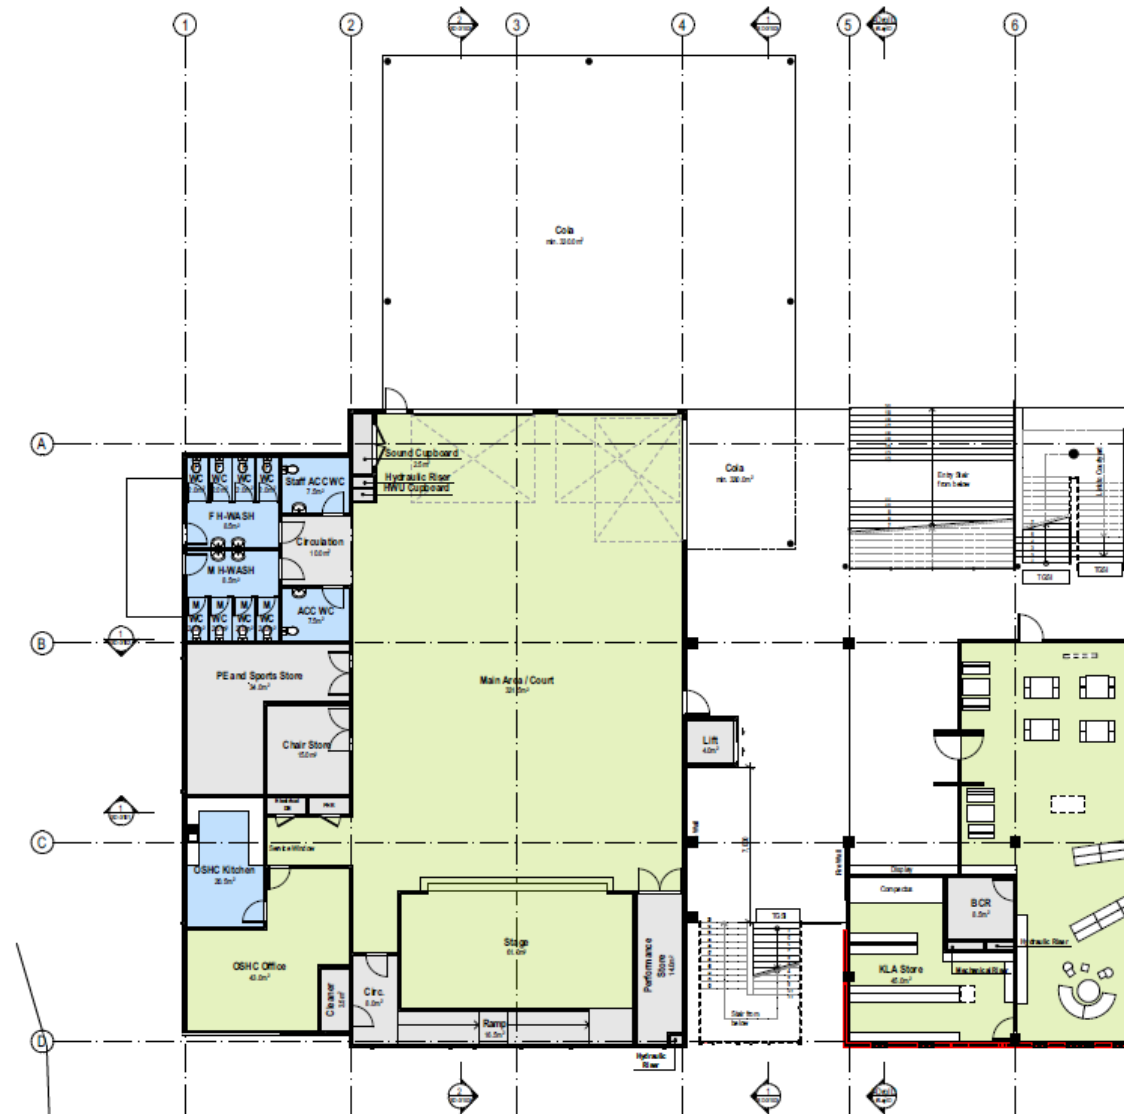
Proposed Building J Level 2 Plan. Source: Fulton Trotter, 2021; Drawing No. SD-2003, Rev F, 13.8.2021.
